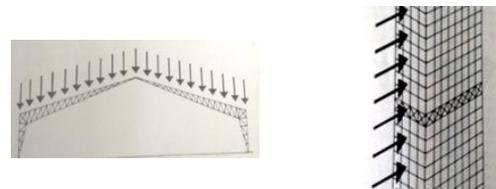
showing horizontal and vertical spans (Source: The design of structural Elements)
